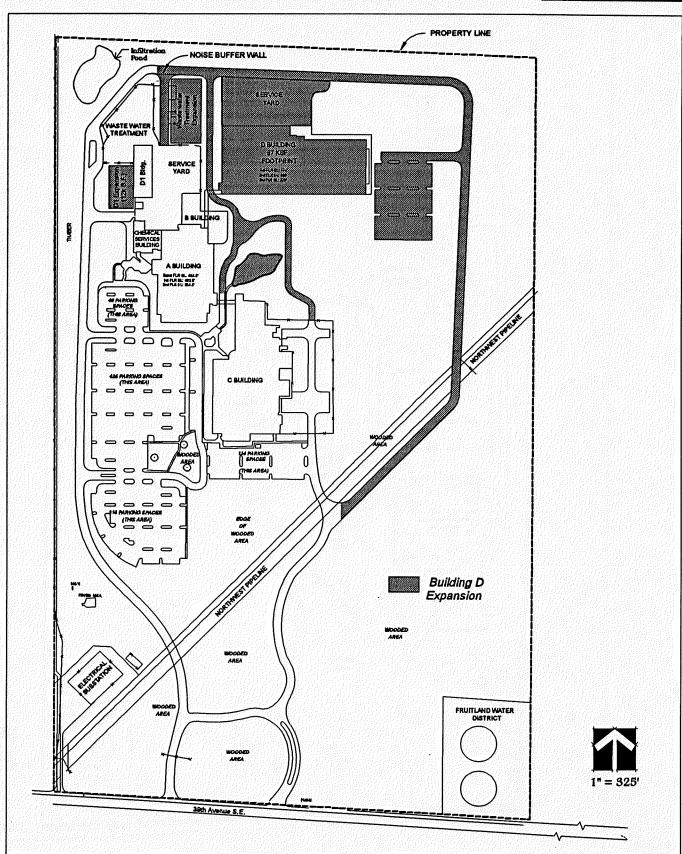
Proposed Expansion Site Plan UTILITIES-WATER
